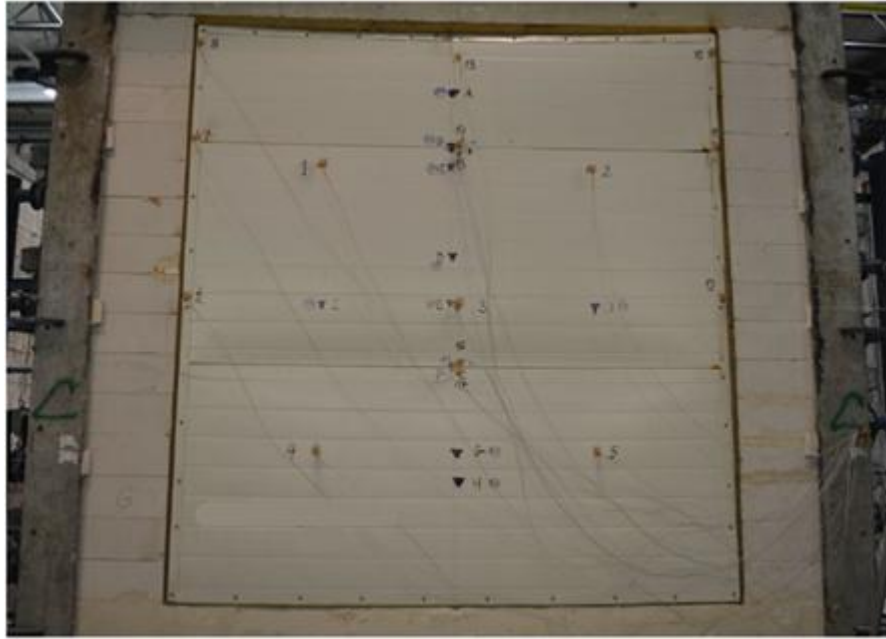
Condition of the tested wall specimen – unheated side of test 1' at the end of the test.
